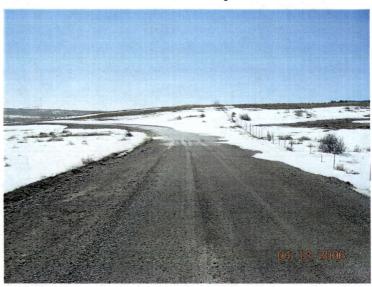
I suggest the operator consider putting a culvert under the entrance road.
